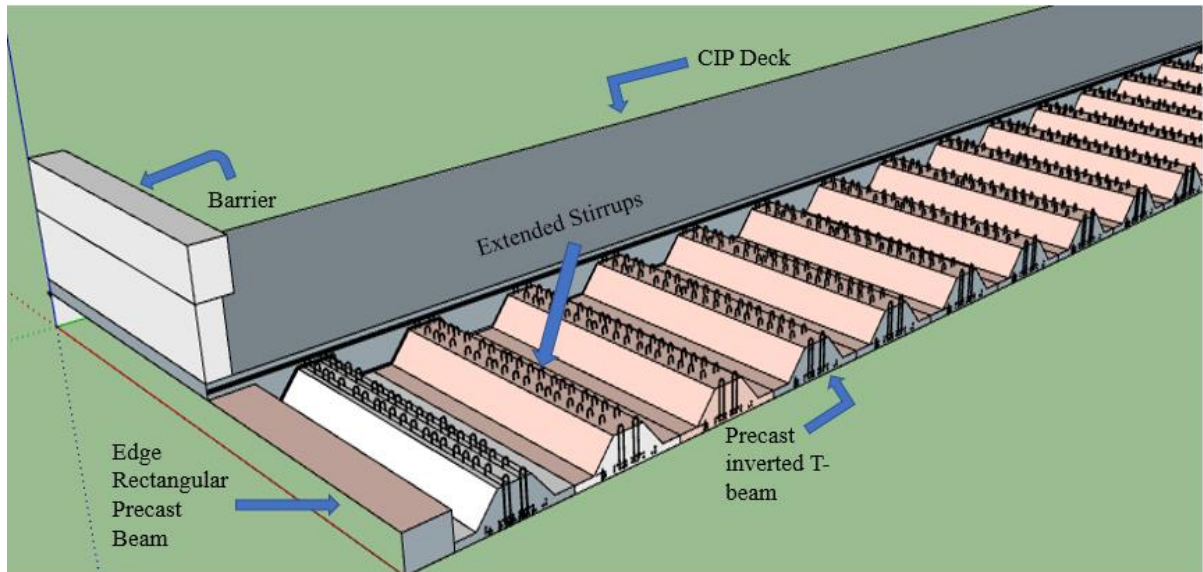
Shows the 3-dimensional view of Bridge with Precast Inverted T-beam
